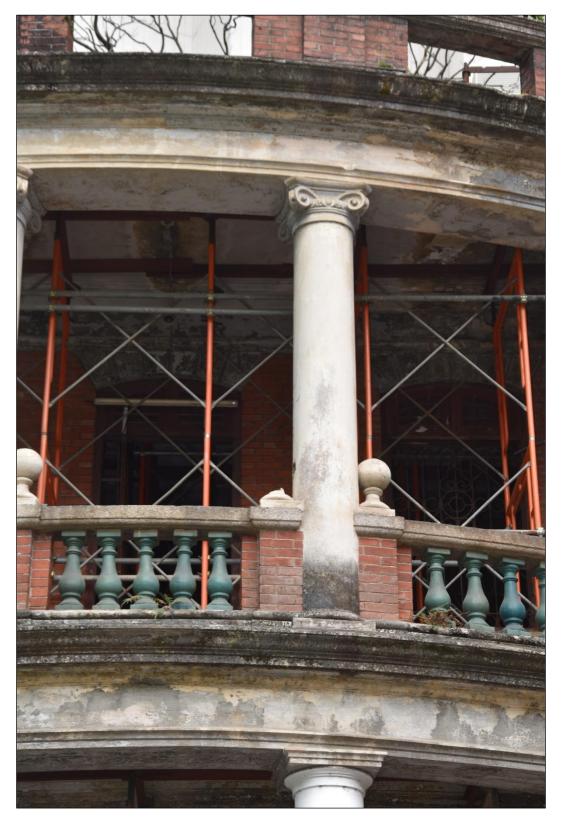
Main Building main facade, the Ionic column on first floor verandah, (21st March, 2023)
